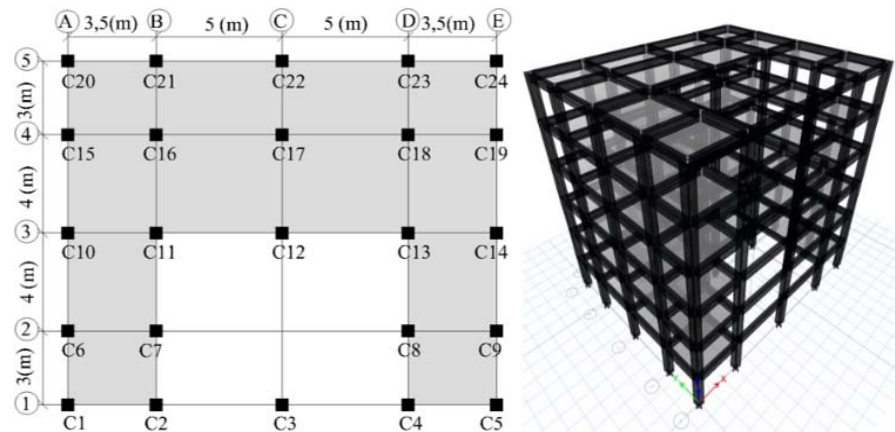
Figure A. Typical floor plan view and 3D view of A2 type irregularity
